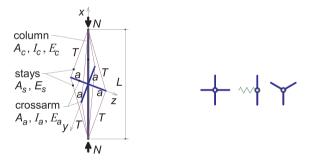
Prestressed stayed column with a central crossarm and possible layout of the crossarms (4 arms, 2 arms with a support for out-of-plane buckling, 3 arms).
